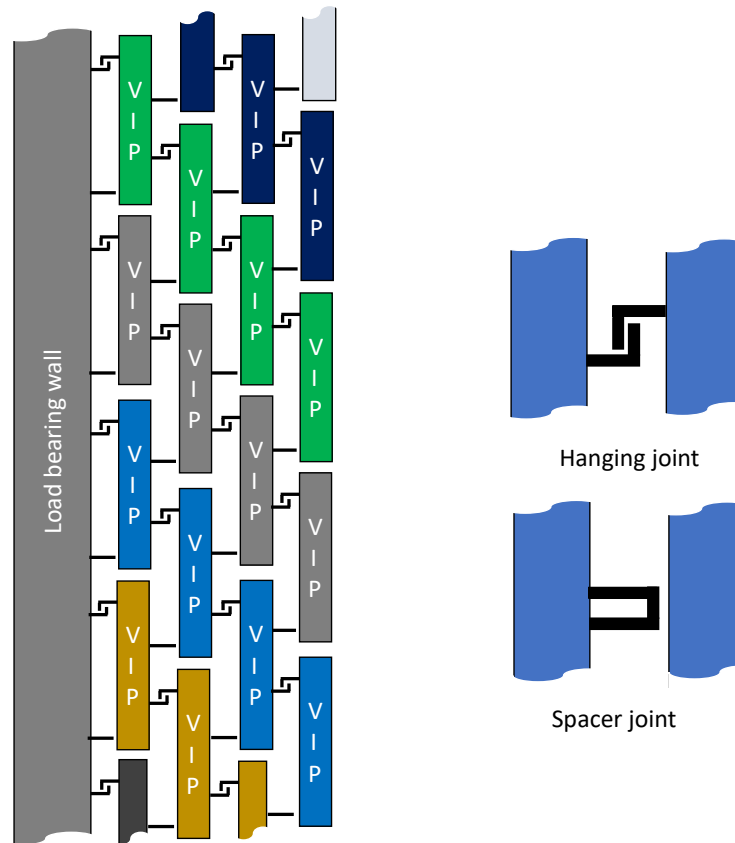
Detail of a section of a single-layer insulation with connection system keeping the panels in place during operation. VIPs with the same color are mutually bearing vertical loads (SC 03)
